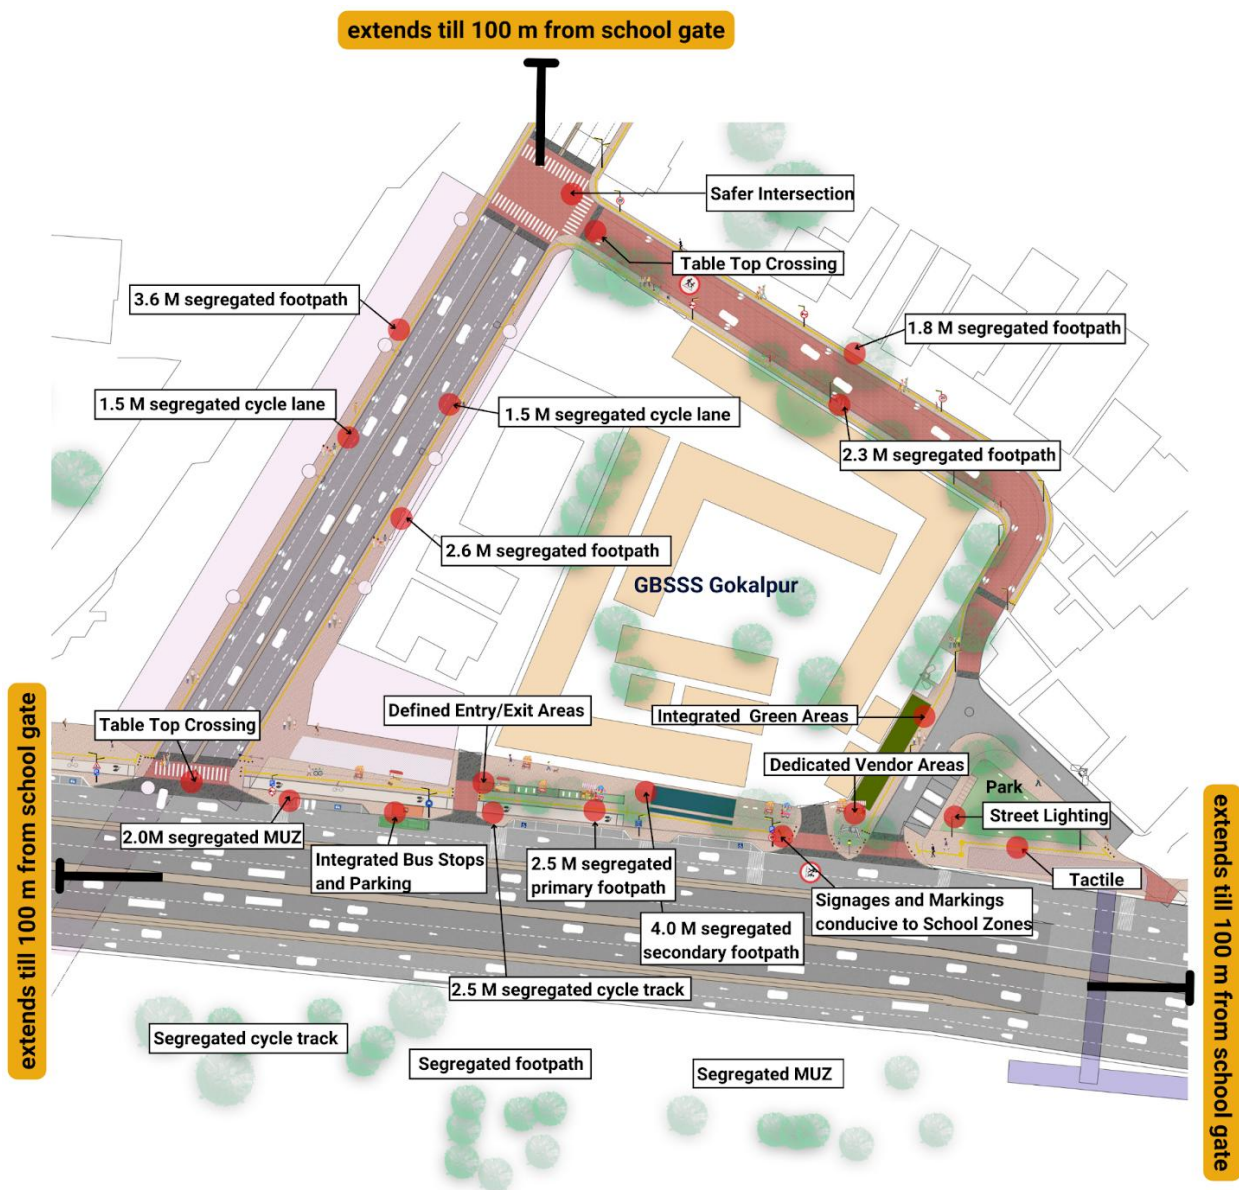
Proposed School Zone Plan for GBSSS Gokalpur Village
